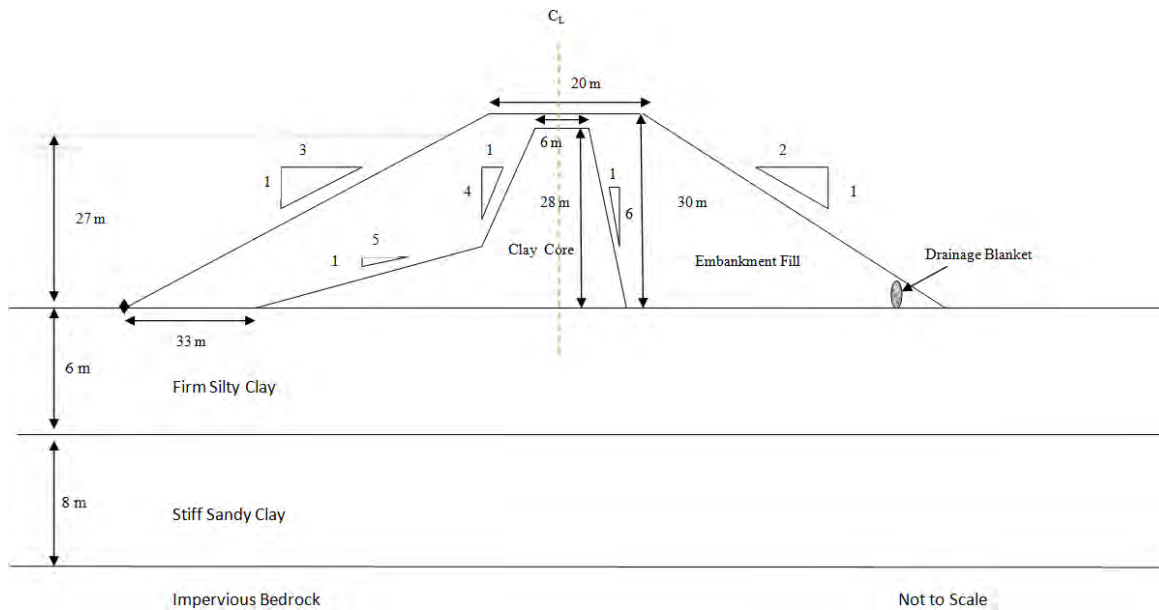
Geometry (not to scale) of the cross section of the Carsington Earth Embankment Dam. (Embankment Dam Profile for Slope Stability Analysis).
